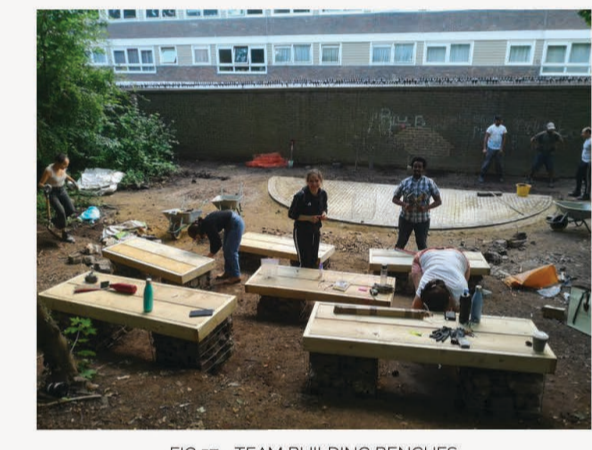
TEAM BUILDING BENCHES MAJOR DAY WITH UNDERGRADS HELP
